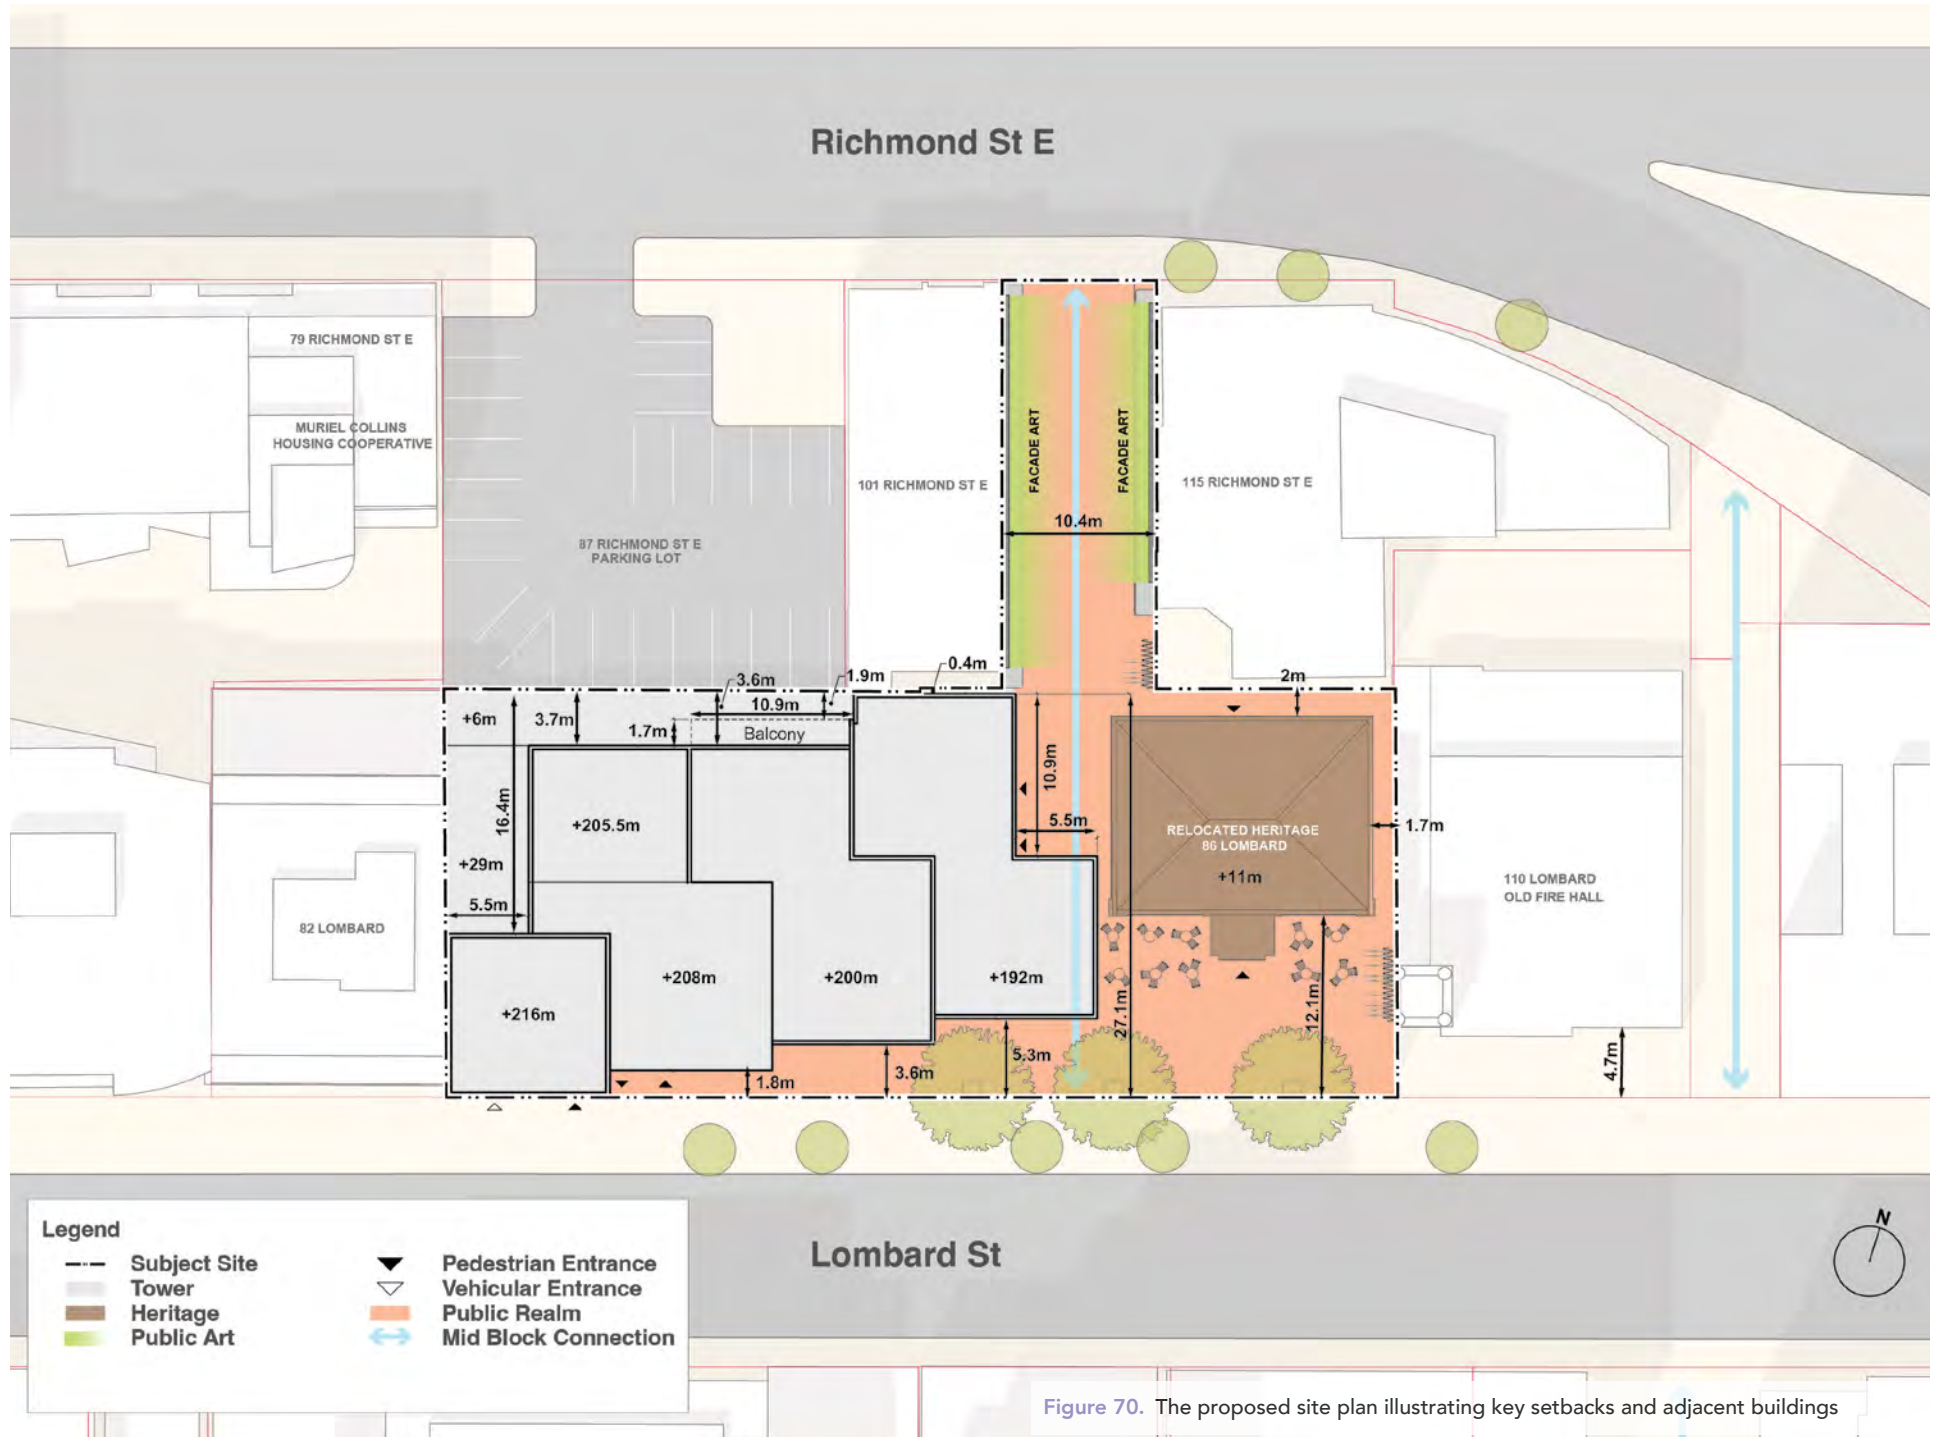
The proposed site plan illustrating key setbacks and adjacent buildings
